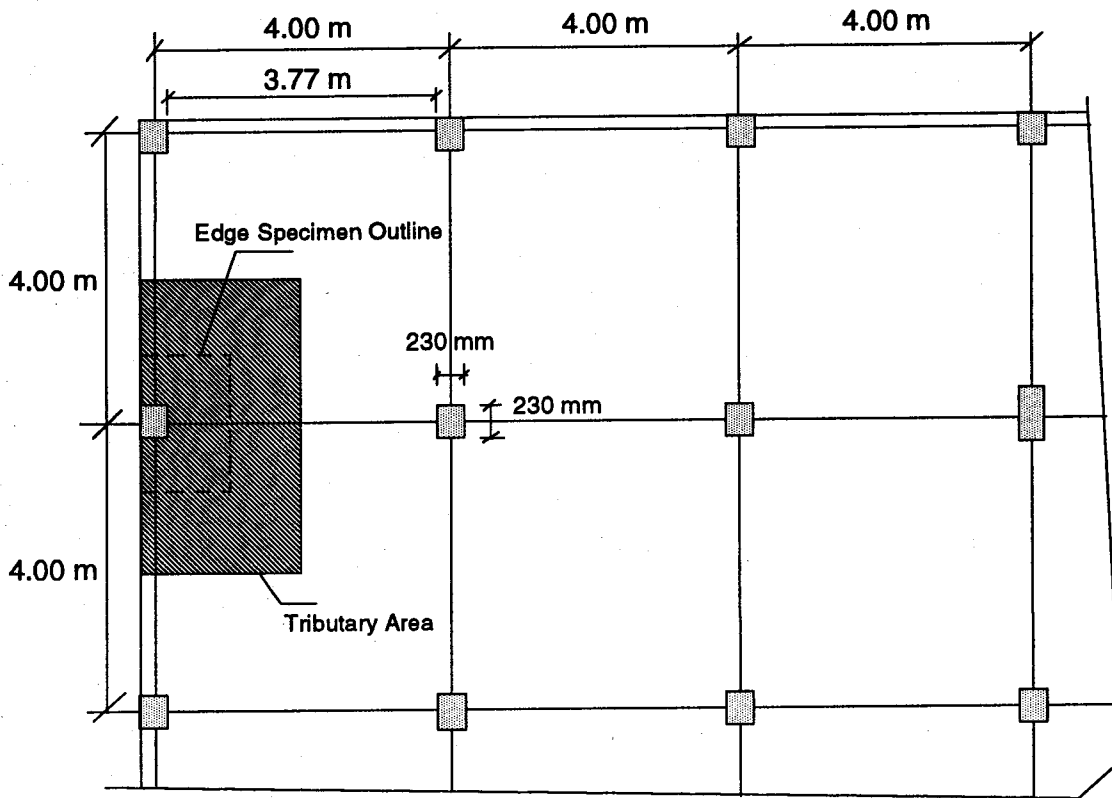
Prototype Flat Plate Structure (Series B Specimens)
